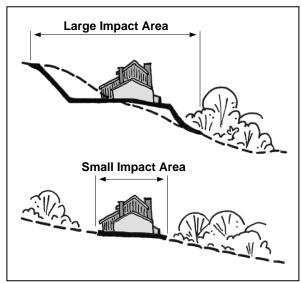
Flattening Steep Slopes for Building Sites Uses More Land Area than Building on Flatter Slopes
